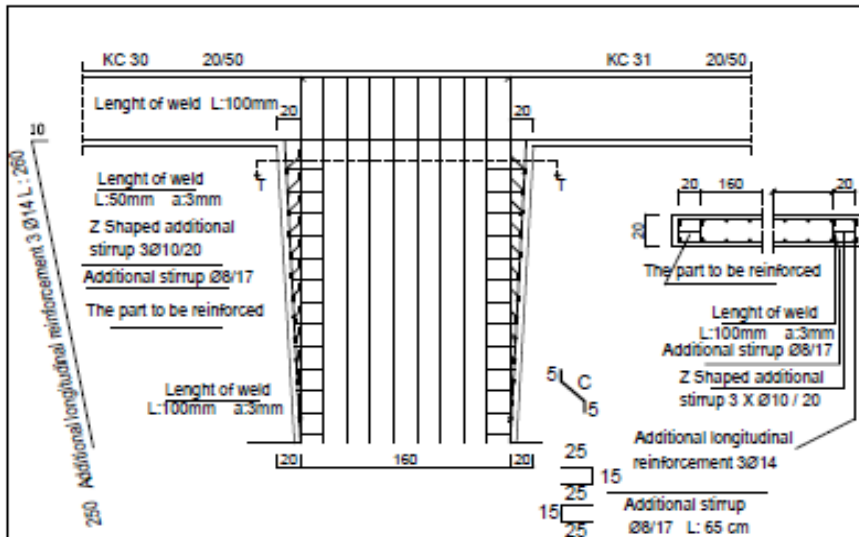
Bilateral reinforcement detail of PC02 shearwall
